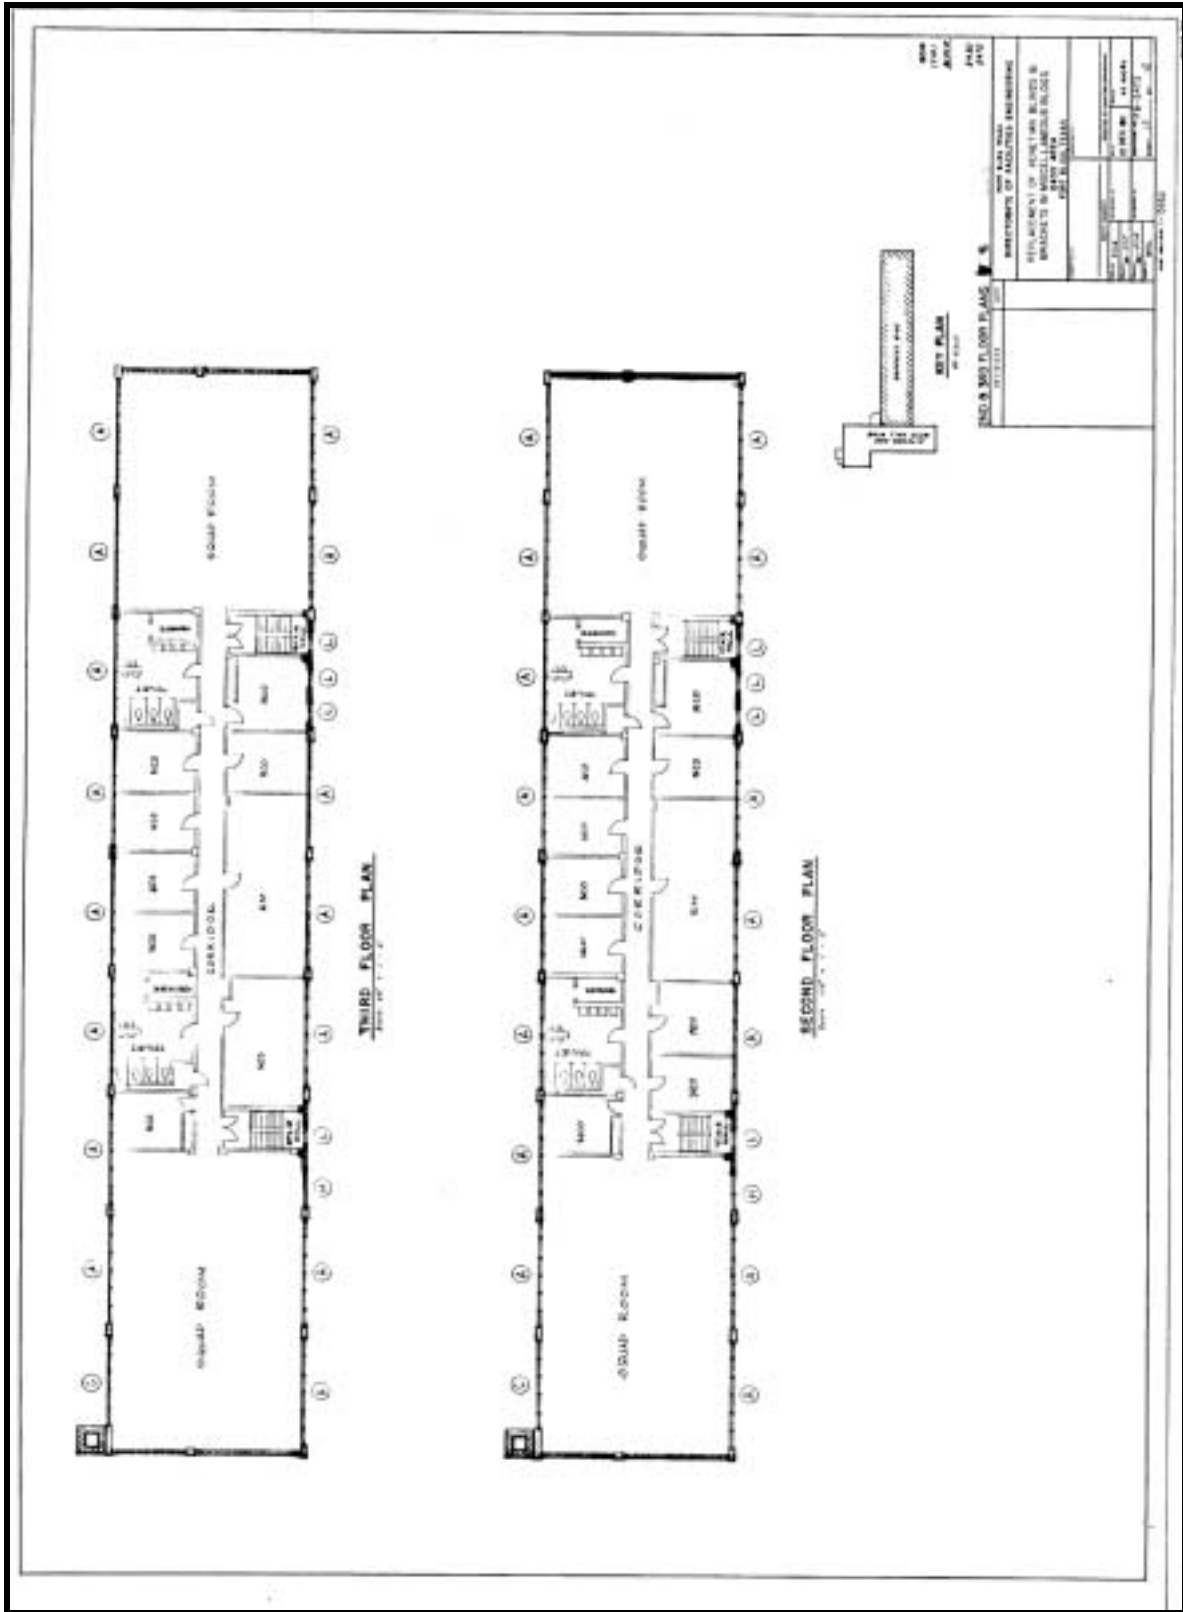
165-man hammerhead barracks, floor plan, barracks wing, 2nd and 3rd floors (1980) (Engineering, Ft. Bliss).
